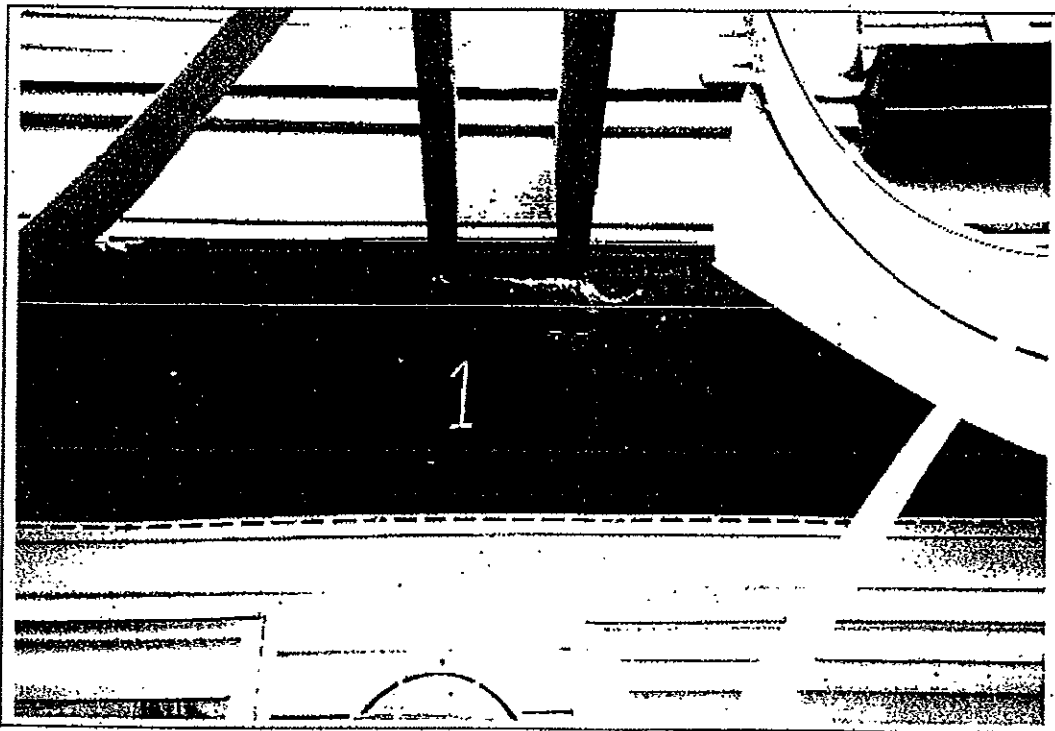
Exploratory opening no. 1, at a location where a bulge in the siding was observed.
